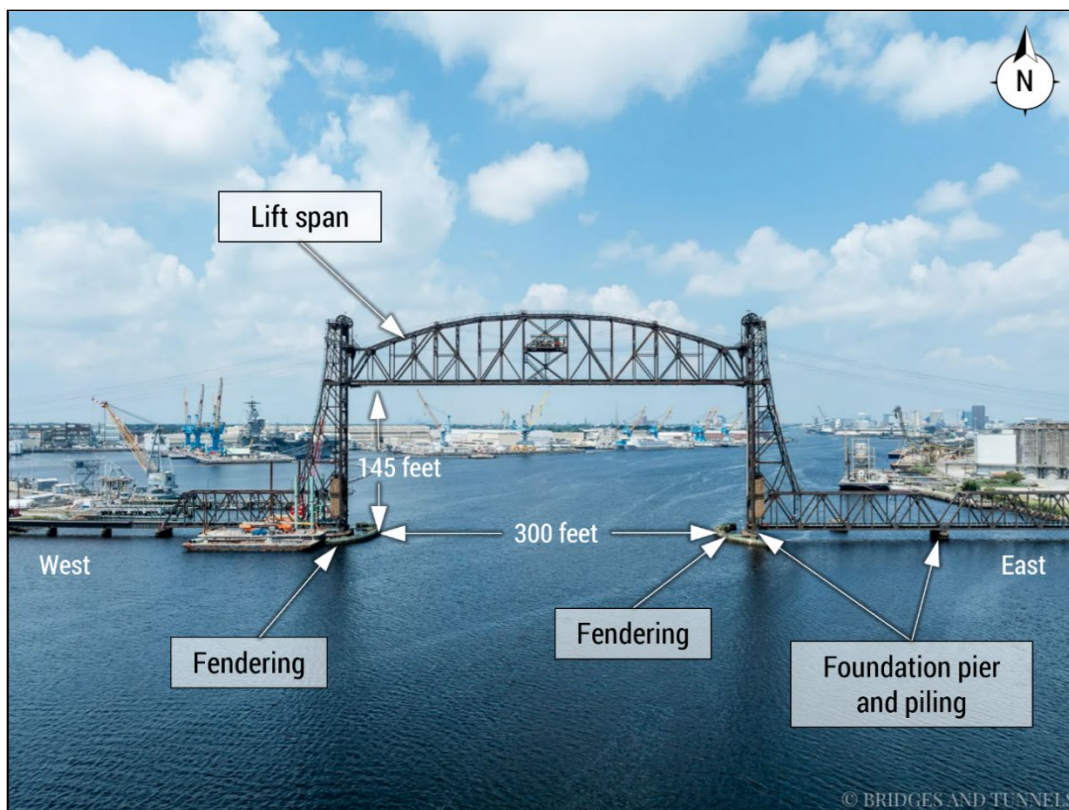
North-facing view of the Norfolk and Portsmouth Belt Line Railroad Bridge with the lift span raised. (Background source: bridgestunnels.com)
